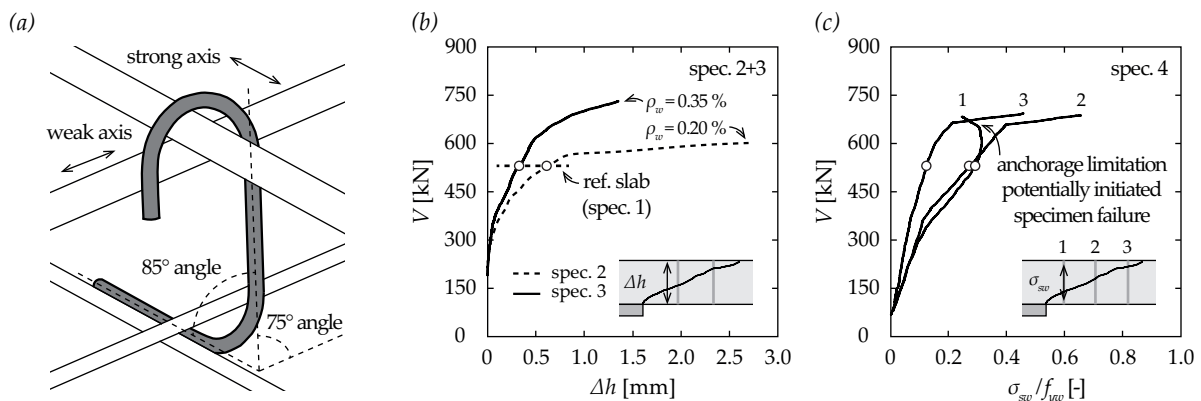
Experimental observations (adapted from [Reg80a]): (a) detail of the transverse reinforcement and definition of weak and strong reinforcement directions of a slab; (b) average slab expansion of slabs with similar layout of transverse reinforcement that presented similar failure mode; and (c) activation of the transverse reinforcement (strong axis)
